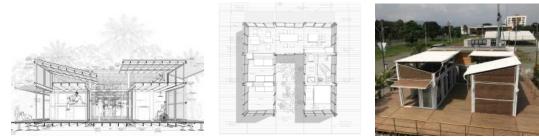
Perspective section, plan and photo of the *Máquina Verde – El Arca* prototype
